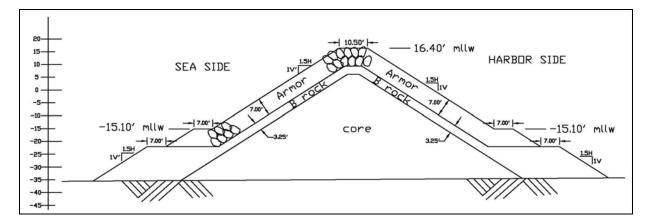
Main Breakwater Extension and North Breakwater Extension Cross Section - Alternative 15.
